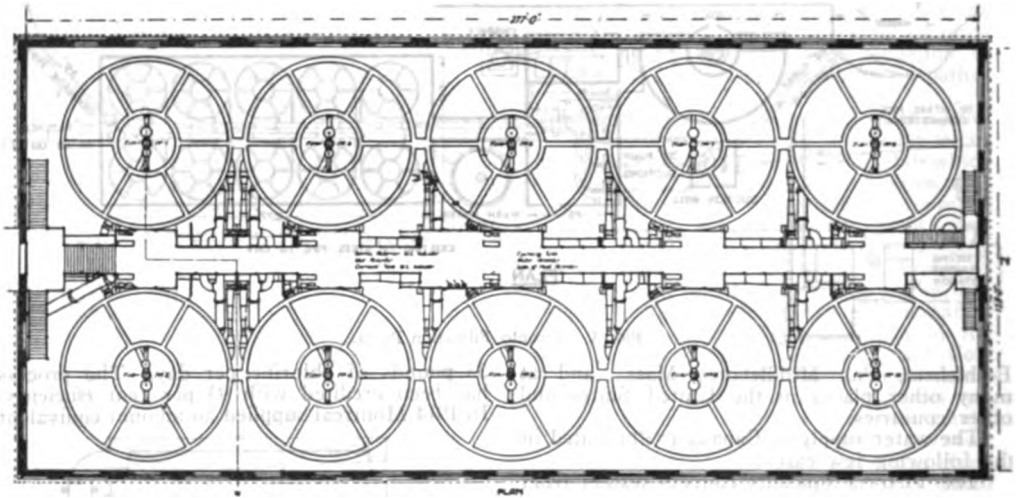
Toronto Filtration Plant—General Arrangement of Pipes in Filter House.
